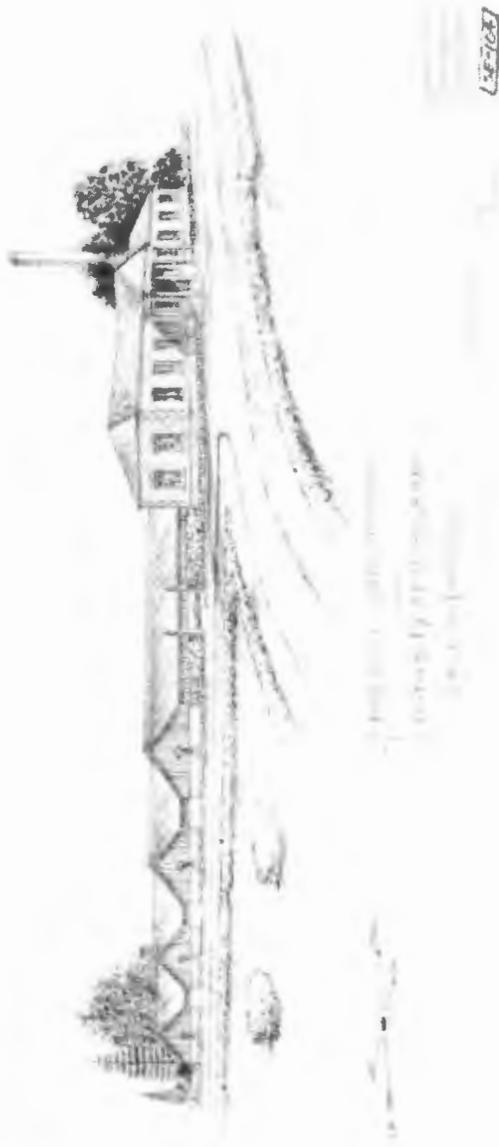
This 1938 architectural rendering shows Howard Cutler's unbuilt design for the new laboratory and headhouse building.
